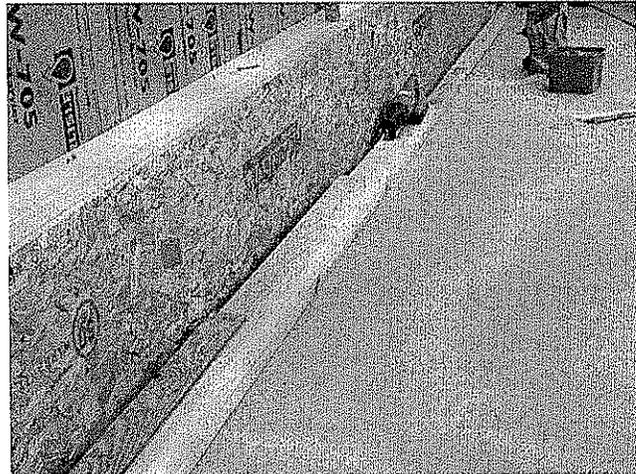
View southwest along the 3rd floor segment F north exterior wall. February 14, 2011.
